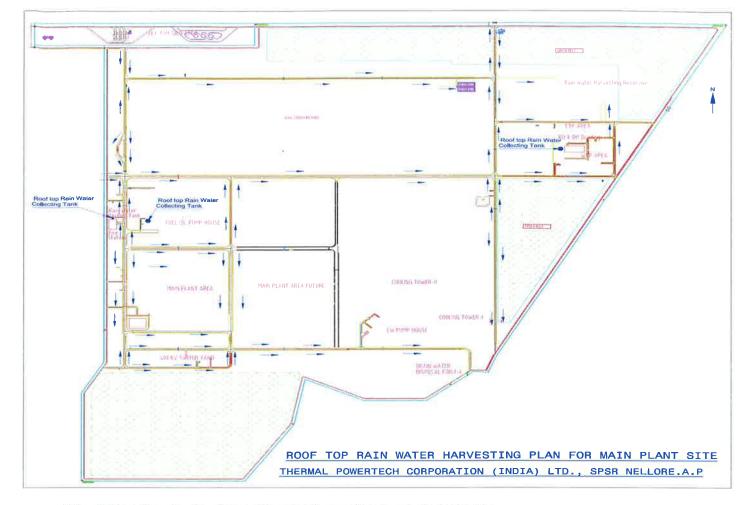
Plan showing Roof top rainwater harvesting for main plant site.
